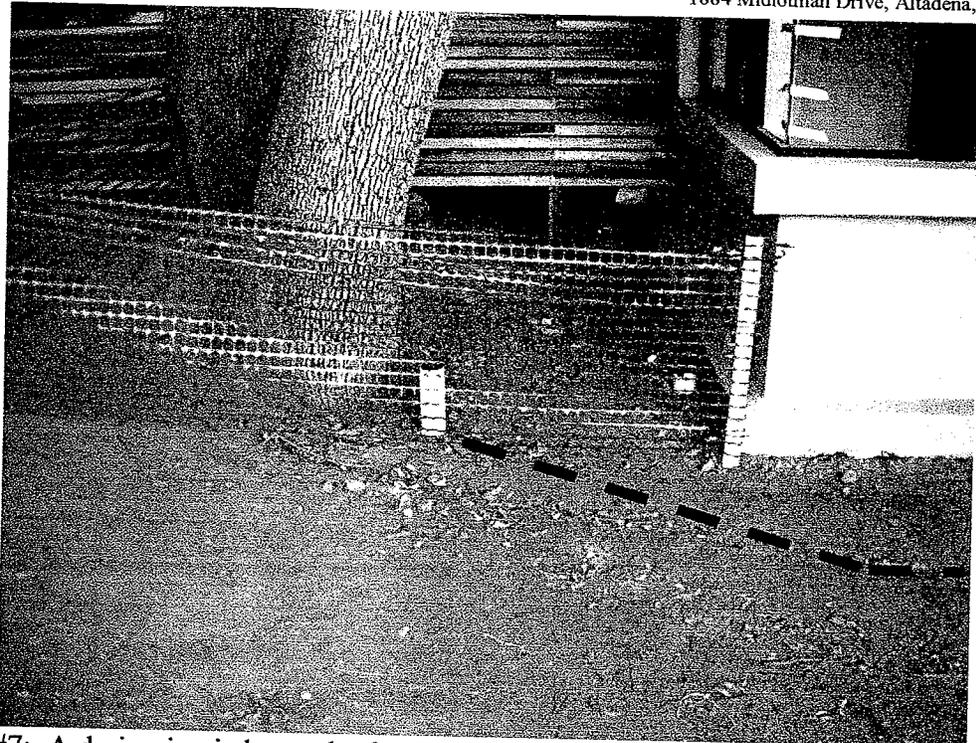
A drain pipe is located a foot from Tree #3. The pipe is 4-6 inches under grade and runs radially from the trunk.
